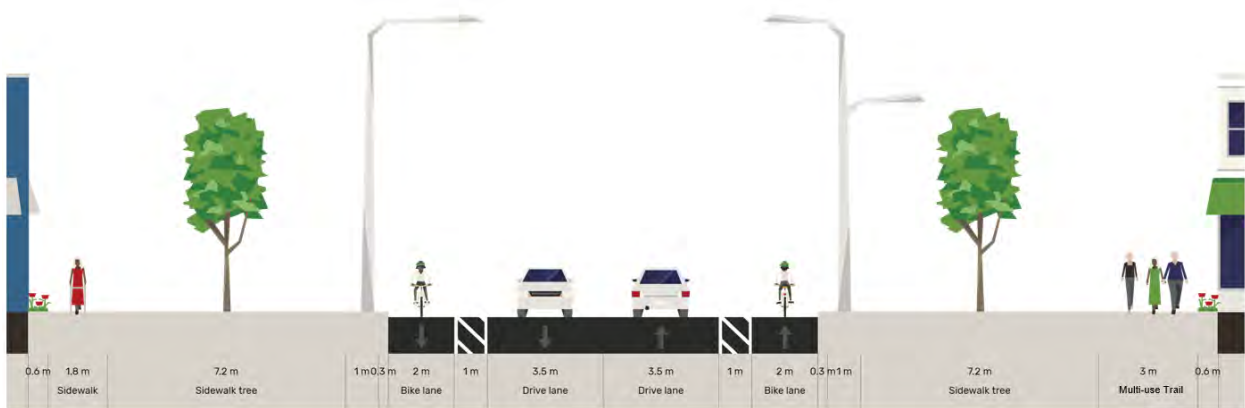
Typical Midblock Cross Section, 36m Type B Arterial, Two-Lane Urban with Class I trail (In-Boulevard Multi-use Trail) and On-Road Cycling Lanes (Bike Lanes)
